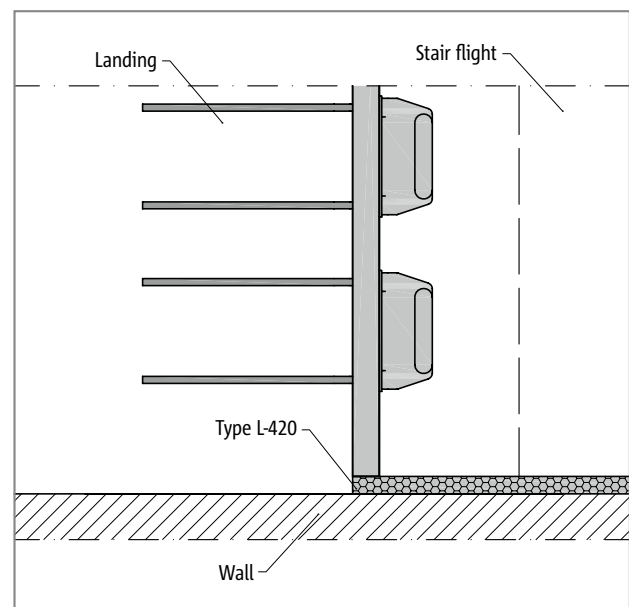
Schöck Tronsole® type T: Element configuration Detail B
